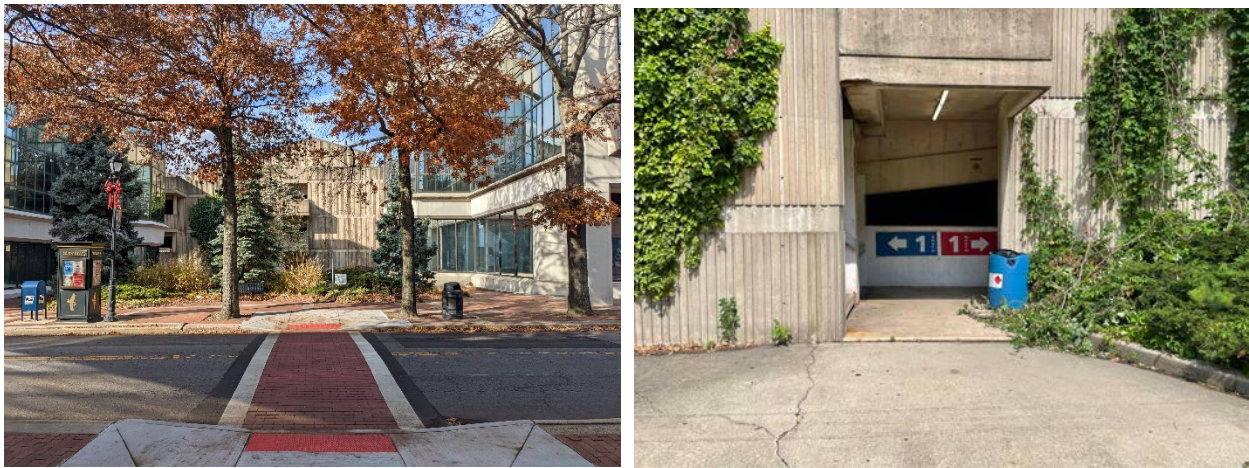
General View of Center Pedestrian Plaza (left) and Entry to Garage Building (right)
